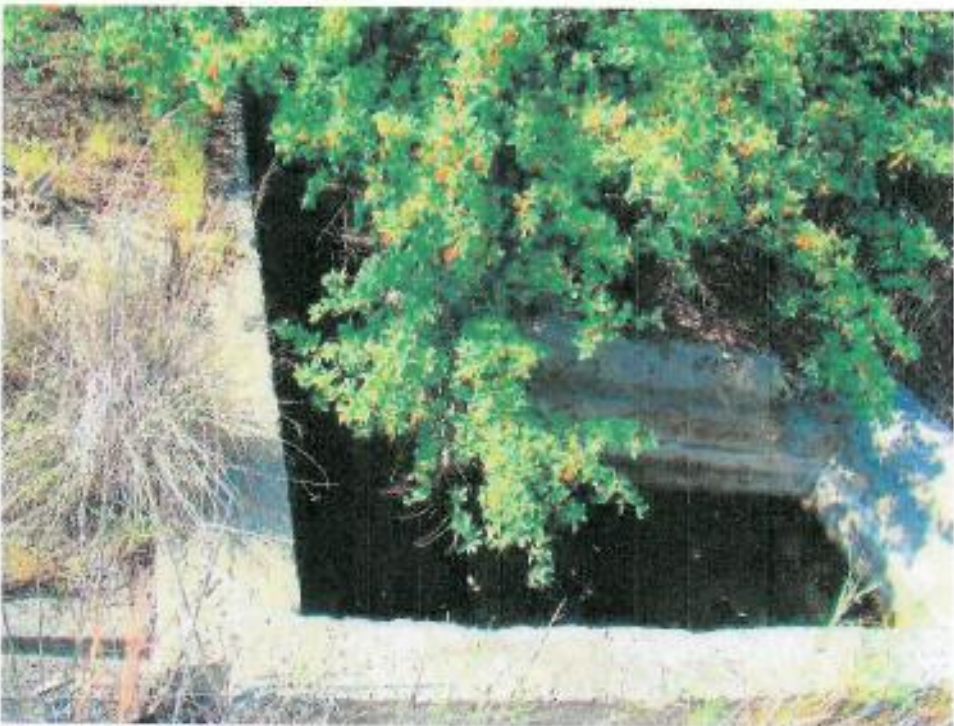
Detail of metal fixtures to surface of Washing Plant area (3)
